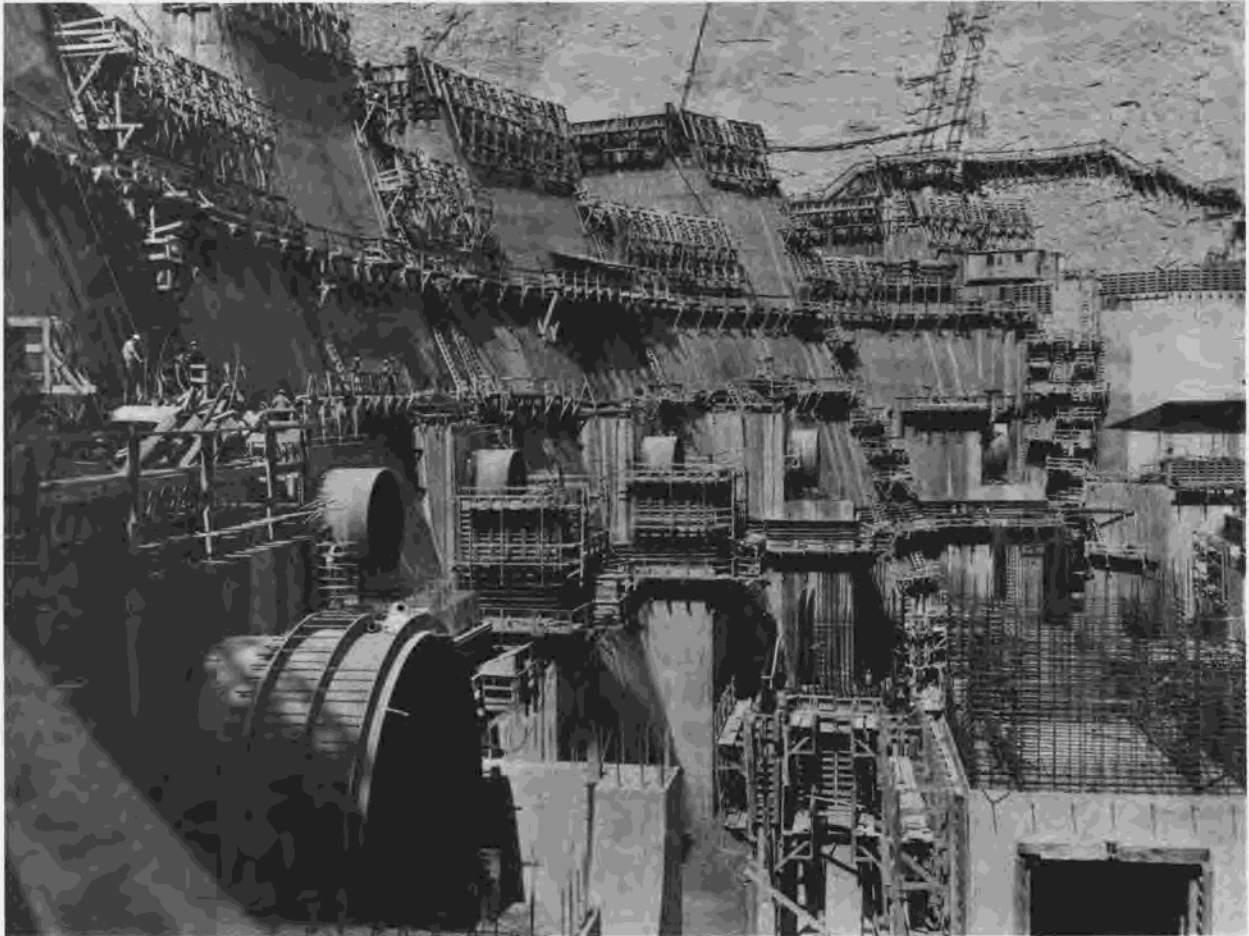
View looking east along downstream face of dam, showing penstock pipes protruding from face of dam. Penstock support is at right foreground. P557-420-6001, May 19, 1961.
